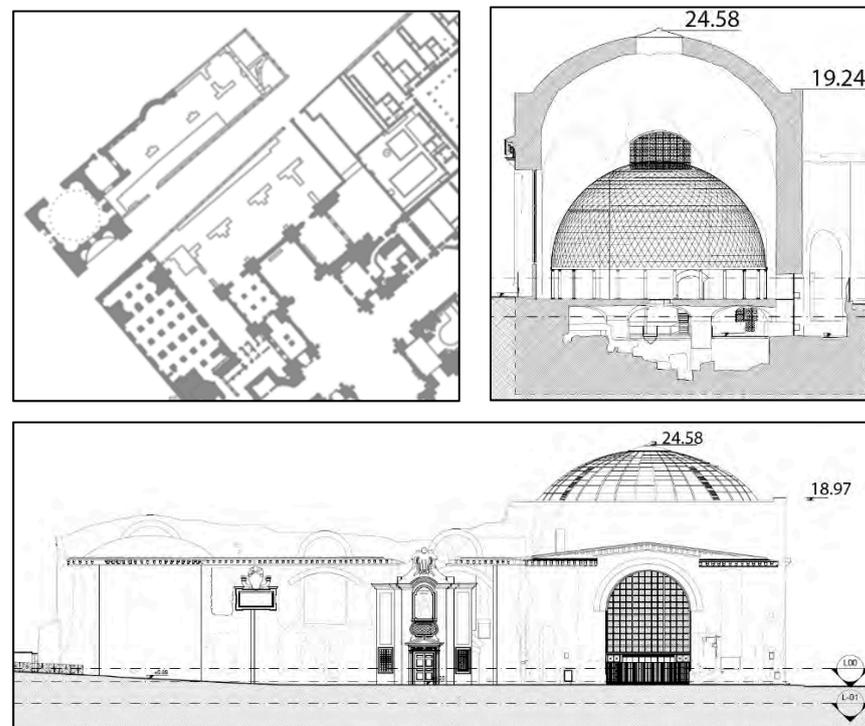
Plan, elevations, sections provided by the Museo Nazionale Romano.
